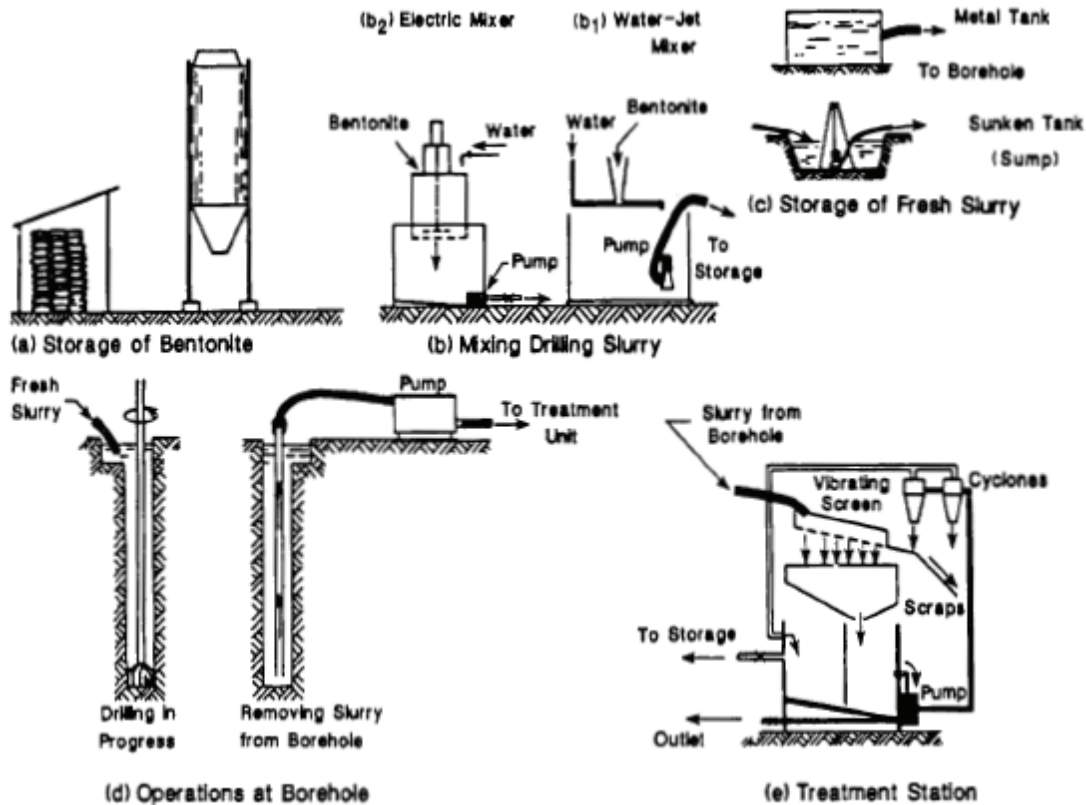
Schematic Diagram of Unit for Mixing and Treating Mineral Slurry (after Le Laboratoire Central des Ponts et Chaussées, 1986)
